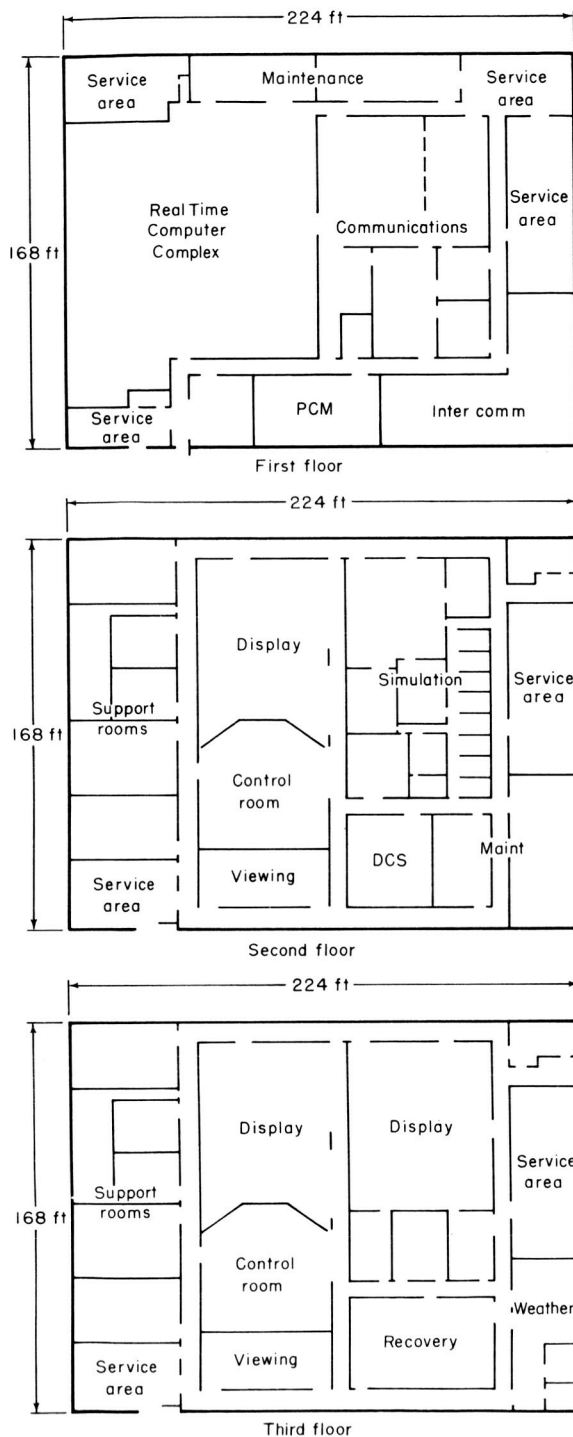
Floor plan of Mission Control Center, Houston, Tex.
